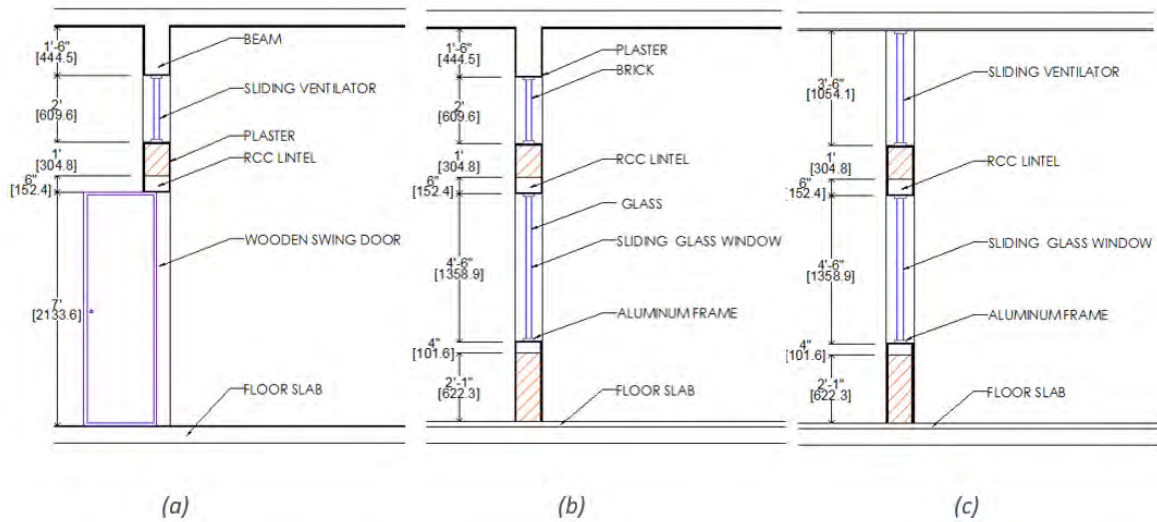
Existing envelope detail of Inpatient room of Cardiology (Ward no 32). (a) Door section on corridor side (b) window section on corridor side (c) window section on exterior wall.
